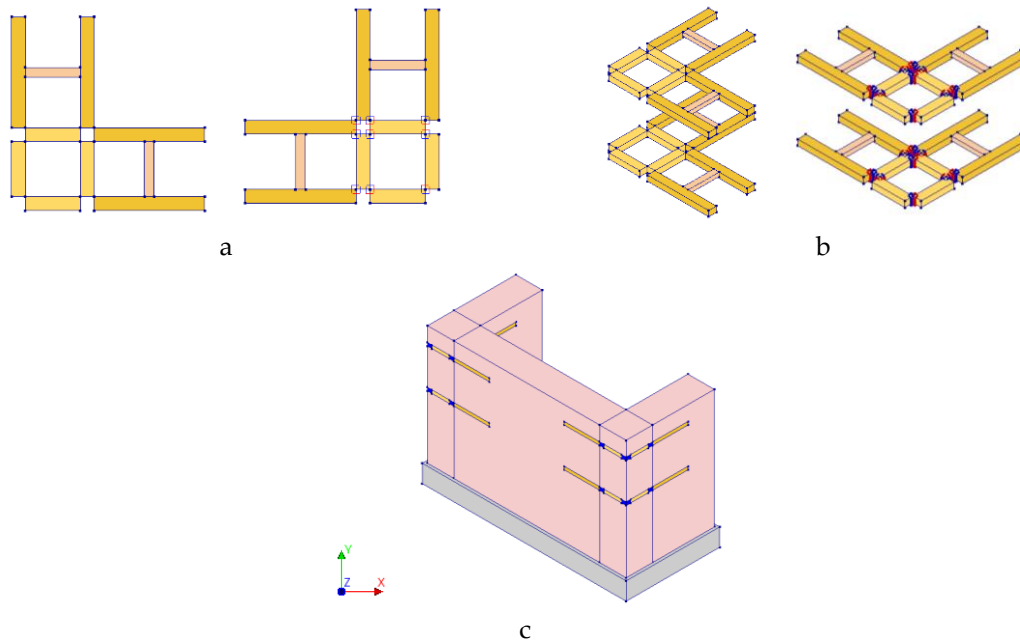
Hinged connections between orthogonal timber braces : (a) Plan view, (b) Overview, (c) Model overview
